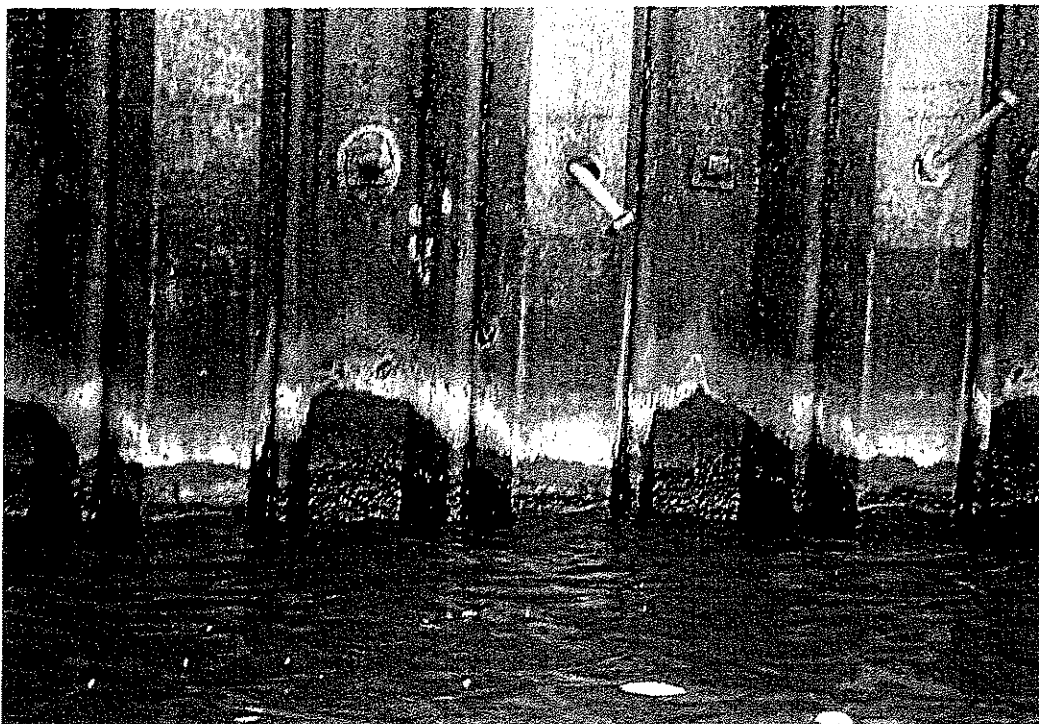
View of Failed Sheet at Station 2+80, Looking North.
